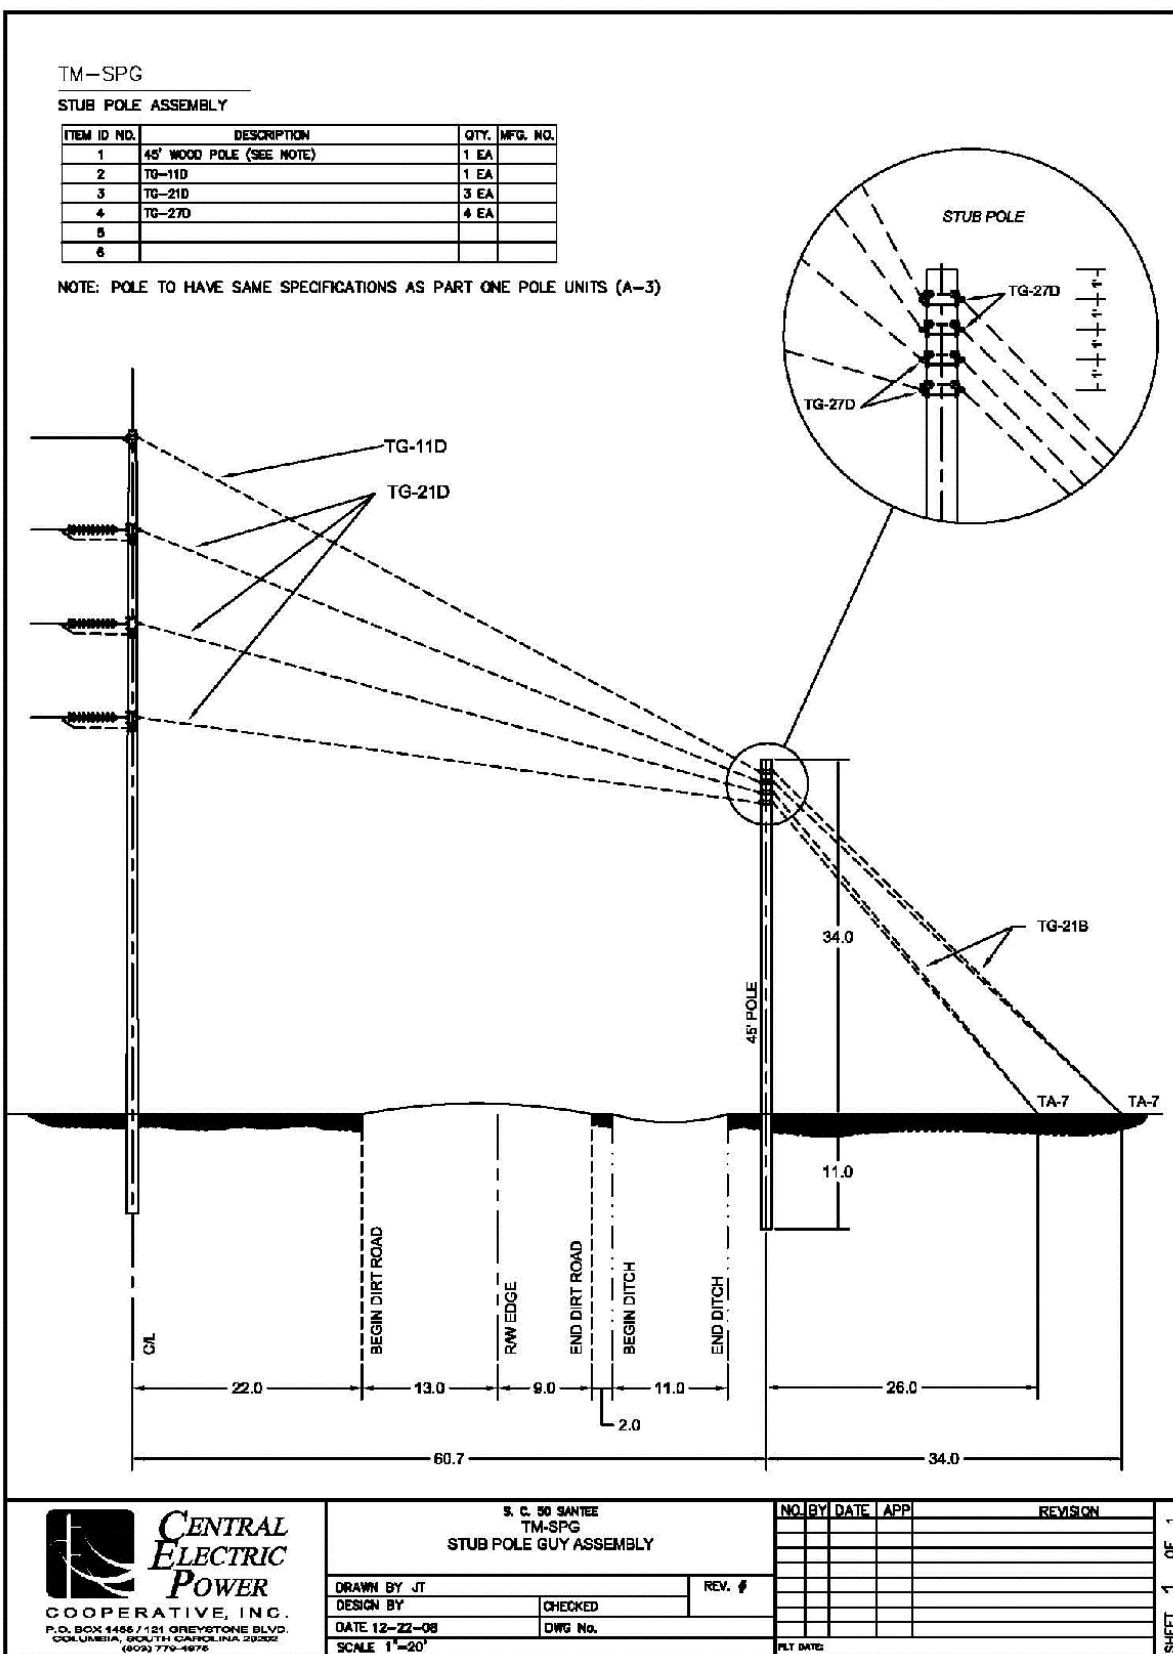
TM-SPG—Stub Pole Guy Assembly
